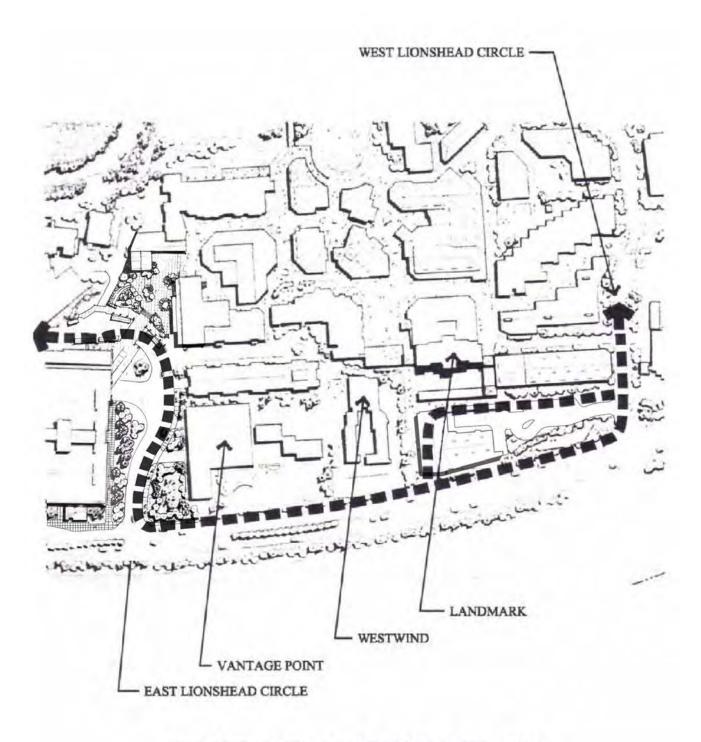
Potential Transit Point Parallel to South Frontage Road
